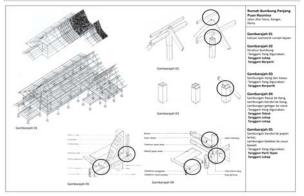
Some Detail study on traditional 'tanggam' system of traditional Malay House,
